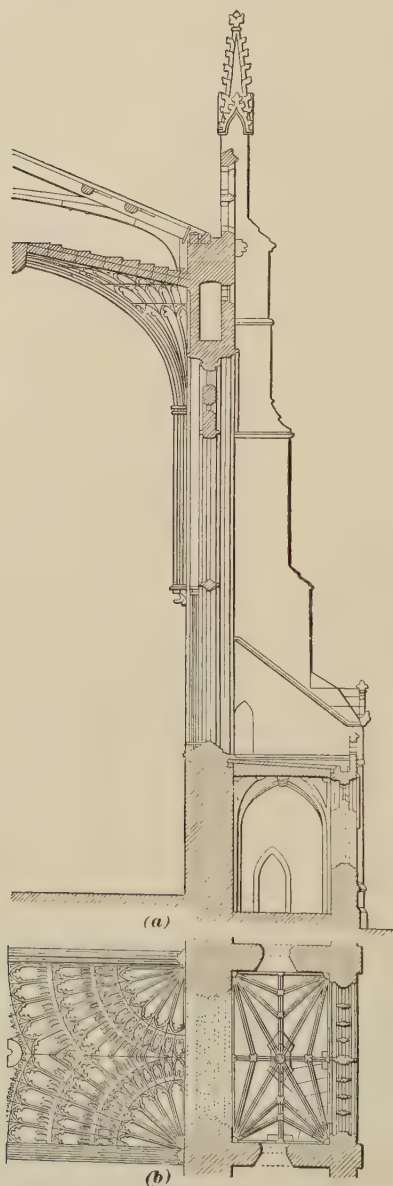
TRANSVERSE SECTION AND PLAN OF
